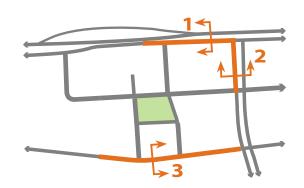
B - PROPOSED STREET SECTIONS - INTERIOR
